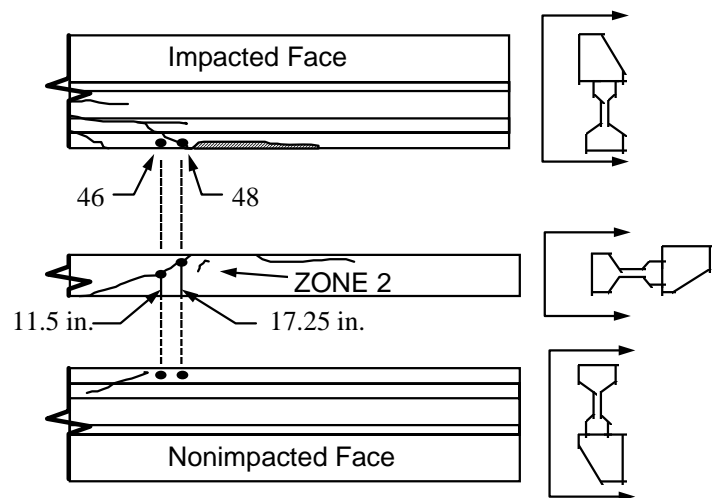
Detailed schematic of Zone 2 damage of Steek girder
